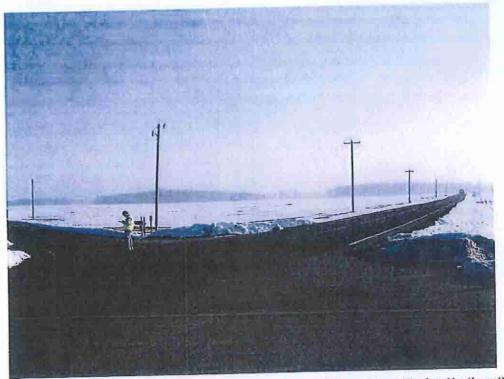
Supplement to Figure 2: Intersection U.S. 36 & Perry Road (Facing Northeast)
